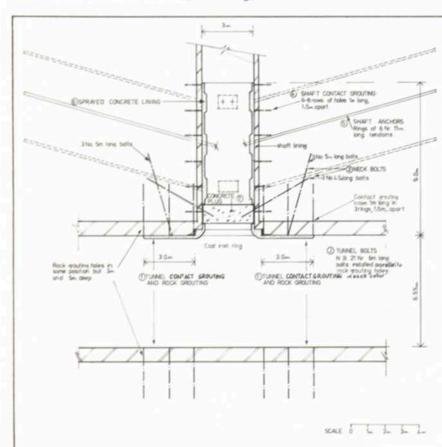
General arrangement of repair, Summit Tunnel, Yorkshire. (Extracted from James Williamson & Partner's Drawing)
